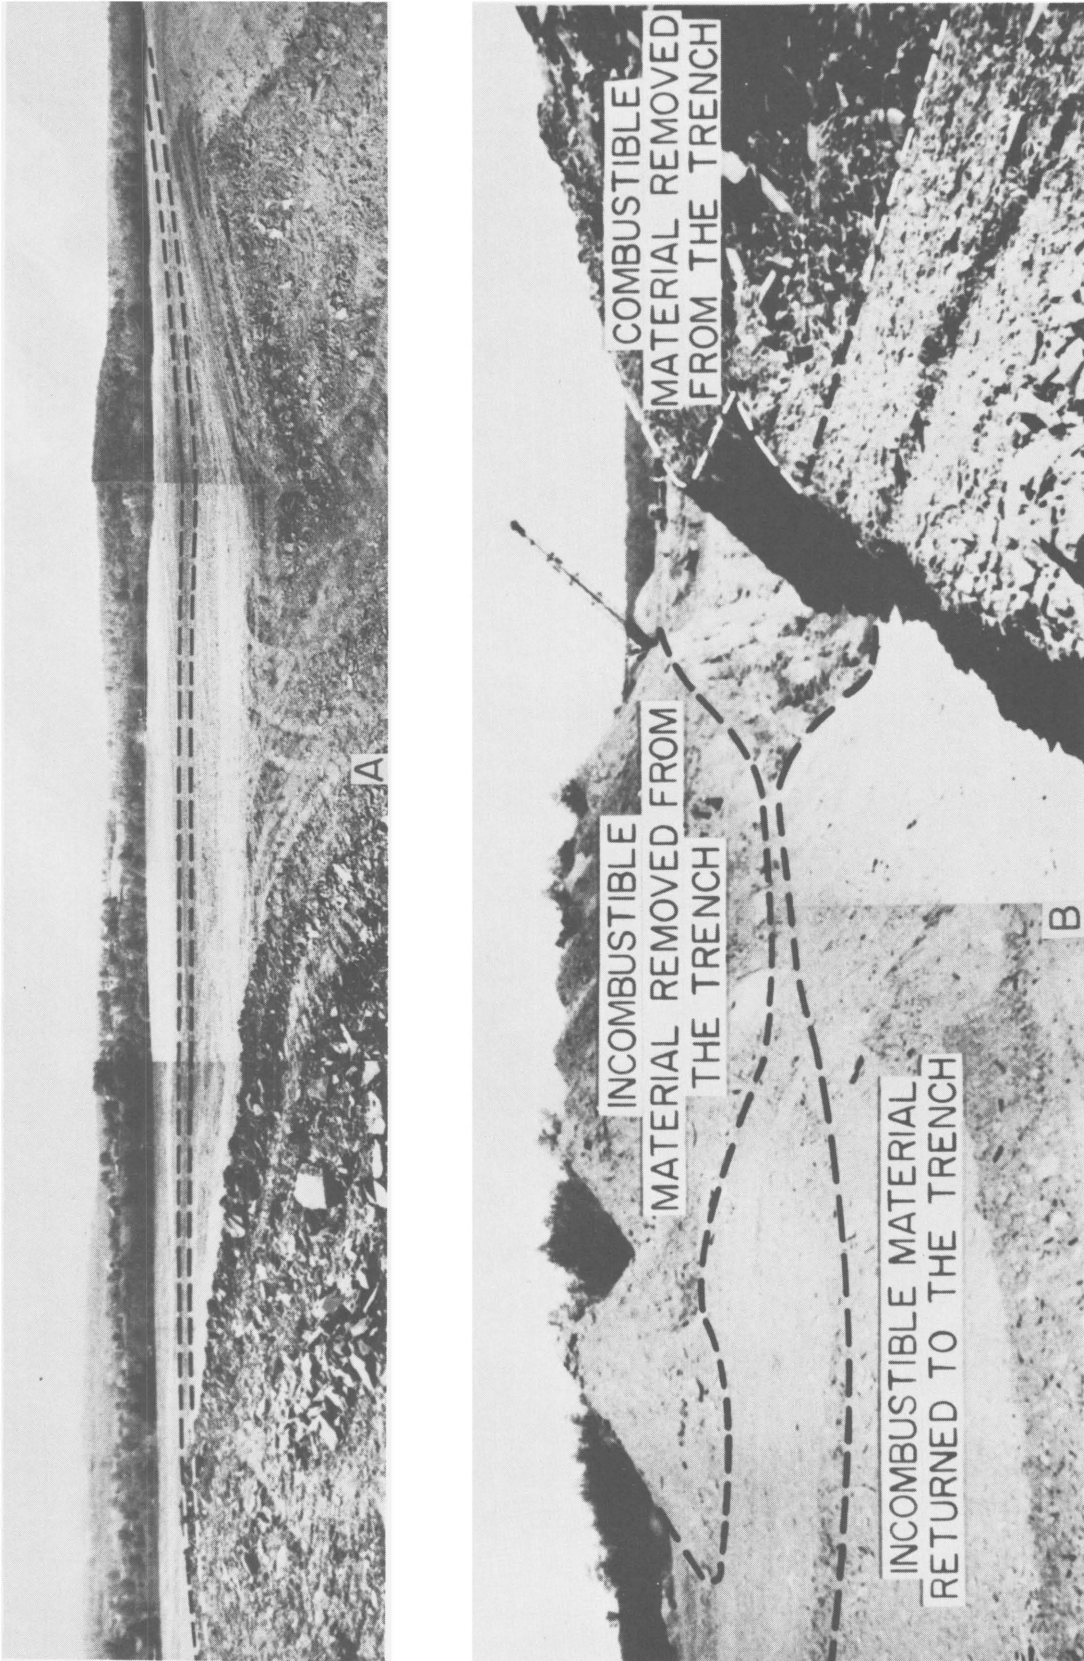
4, Looking Over Completed Project. (Dotted line shows approximate location of trench.) B, Looking Along Trench. (Shows separation of excavated materials used for backfilling purposes.)
